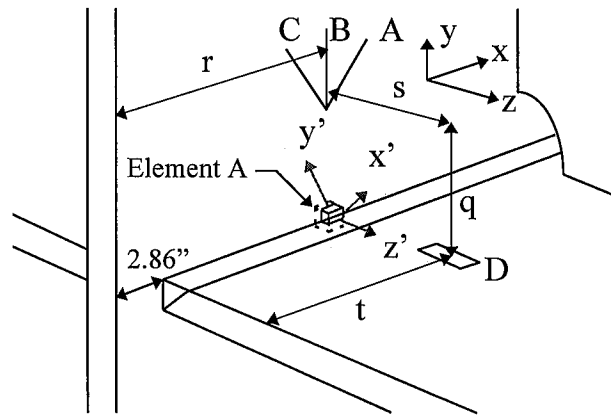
Element A (Specimen 3/ SE Girder-to-Column Weld Region)
